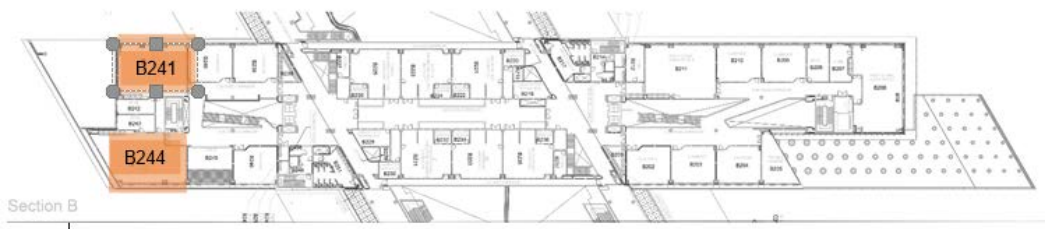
First floorplan of Section B, H07 – architectural design studios (not to scale)
